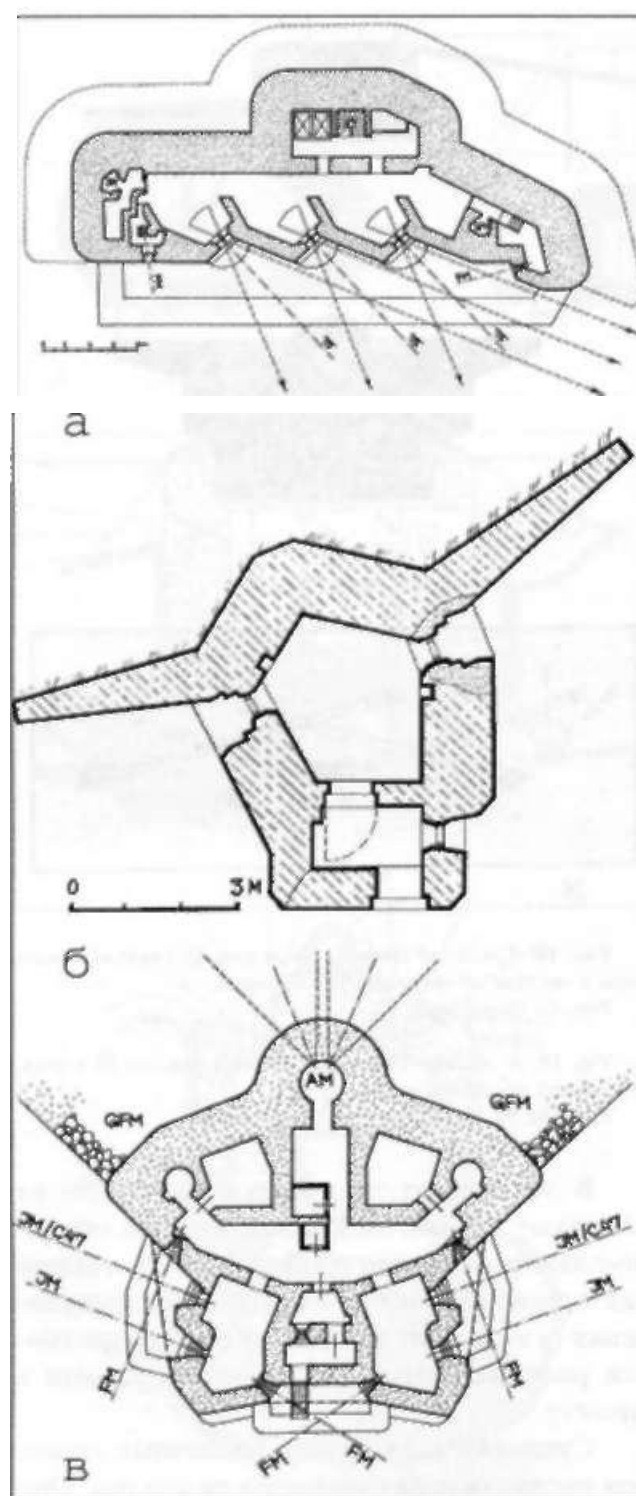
Li traditor (schemes): а) cross-section; б) a plan; в) traditors on defensive line.
